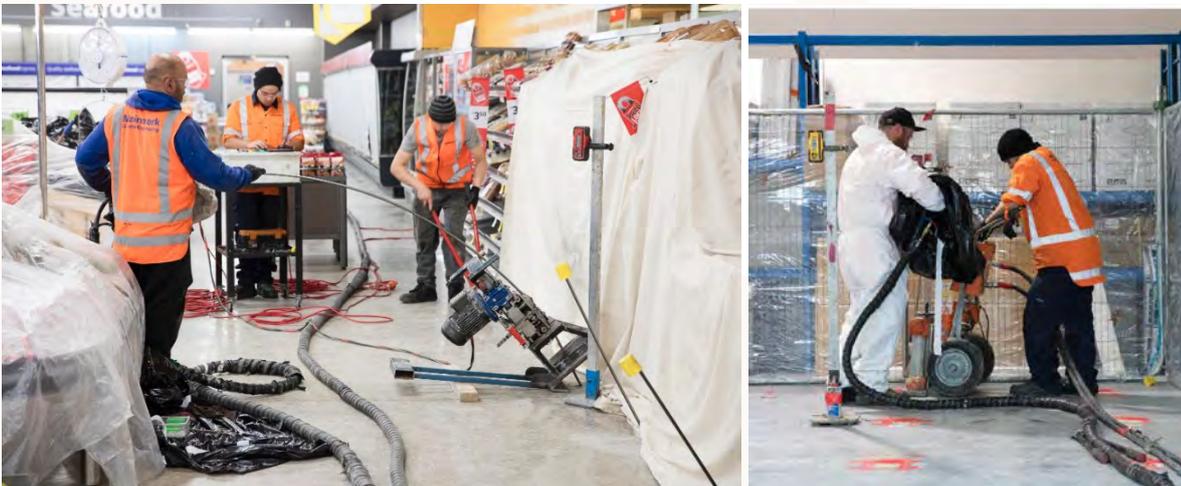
Installing grout tubes (left) and injecting resin (right) inside a supermarket (see Section 4.2)
